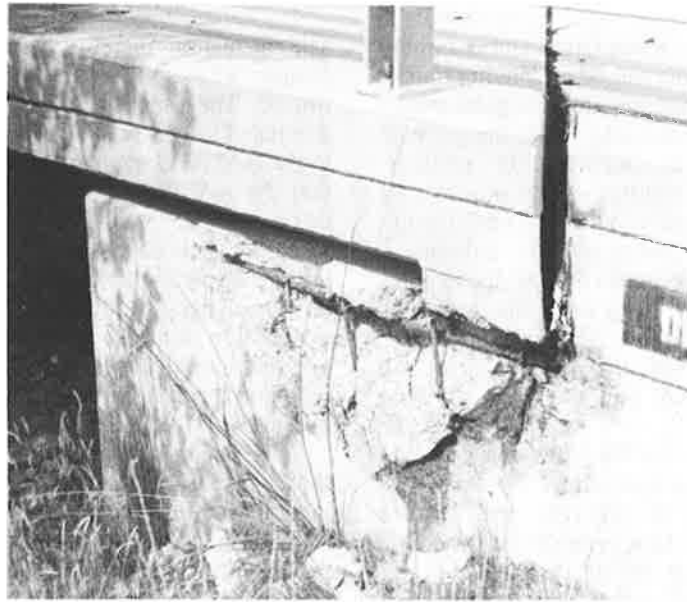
Severe spalling of concrete at abutment due to transverse thermal movement
